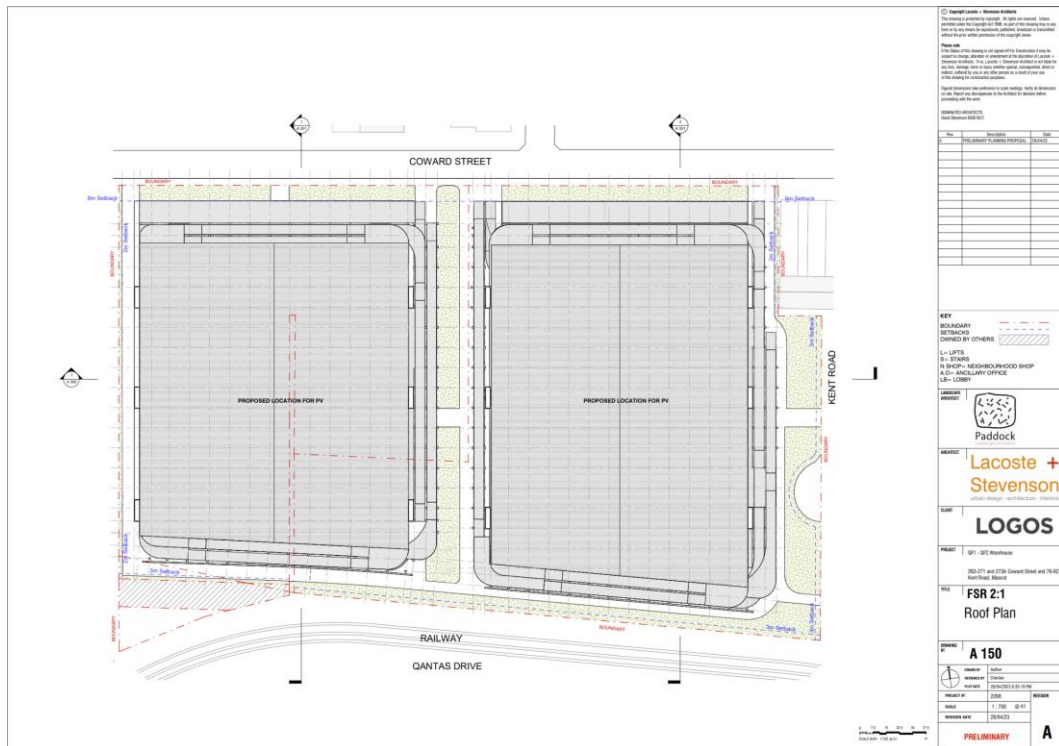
Proposed development site PV Panel Roof Layout (LOGOS)
